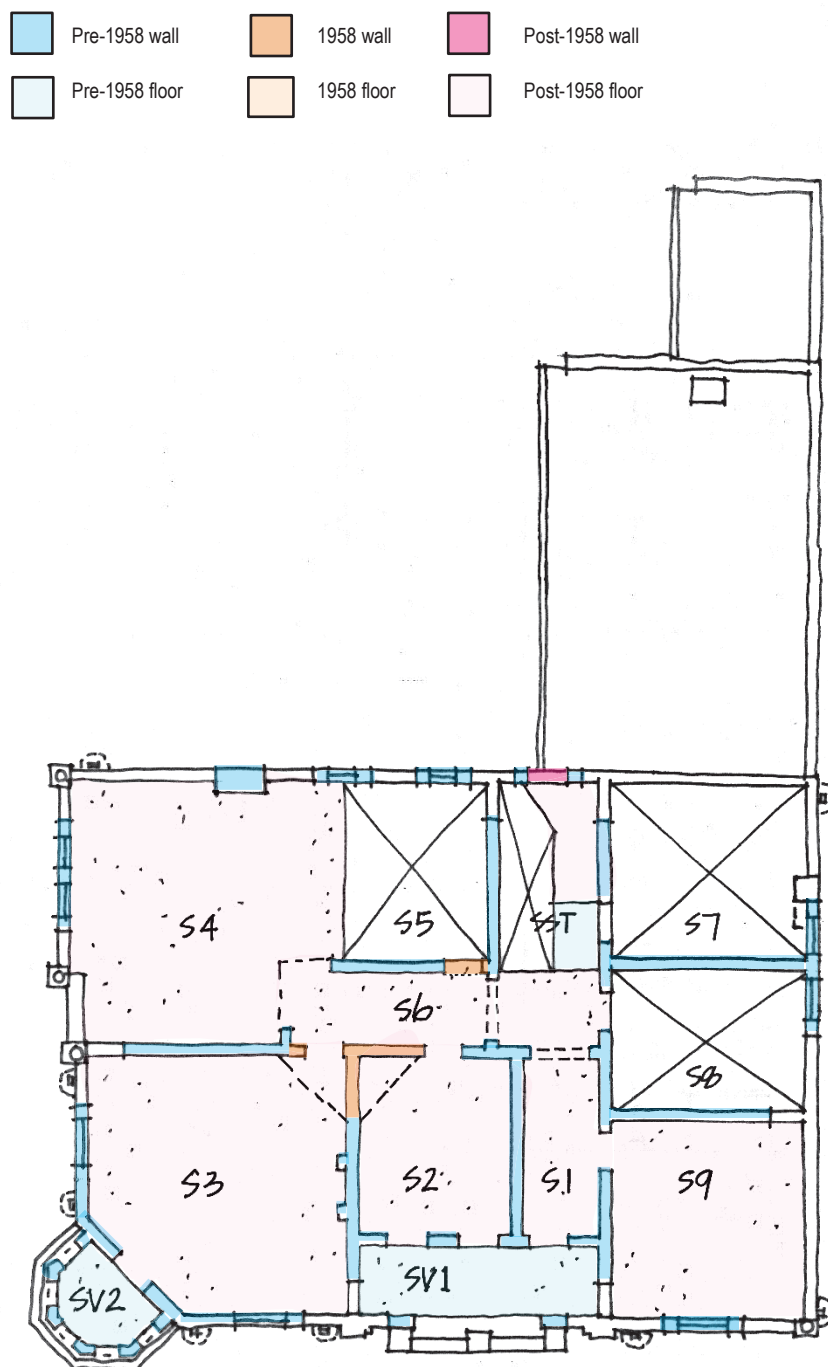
Diagrammatic second floor plan showing existing fabric from different eras
